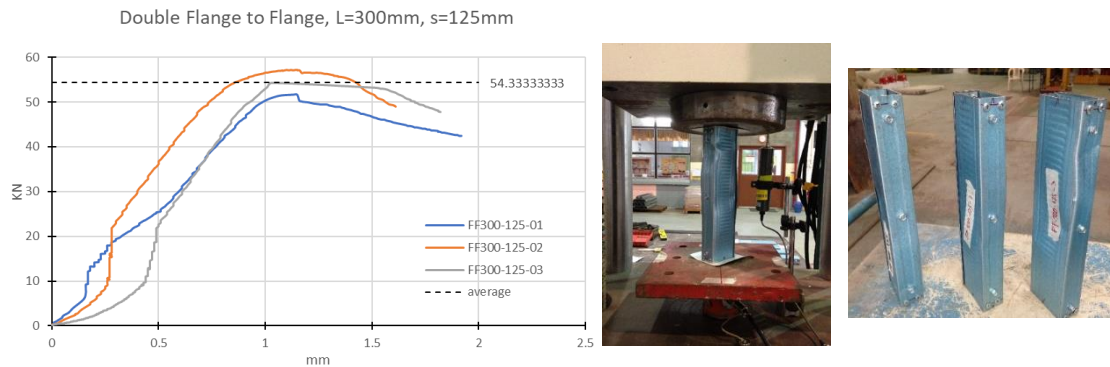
Graphic and picture testing results for double profile flange to flange, L=300 mm (FF300).
